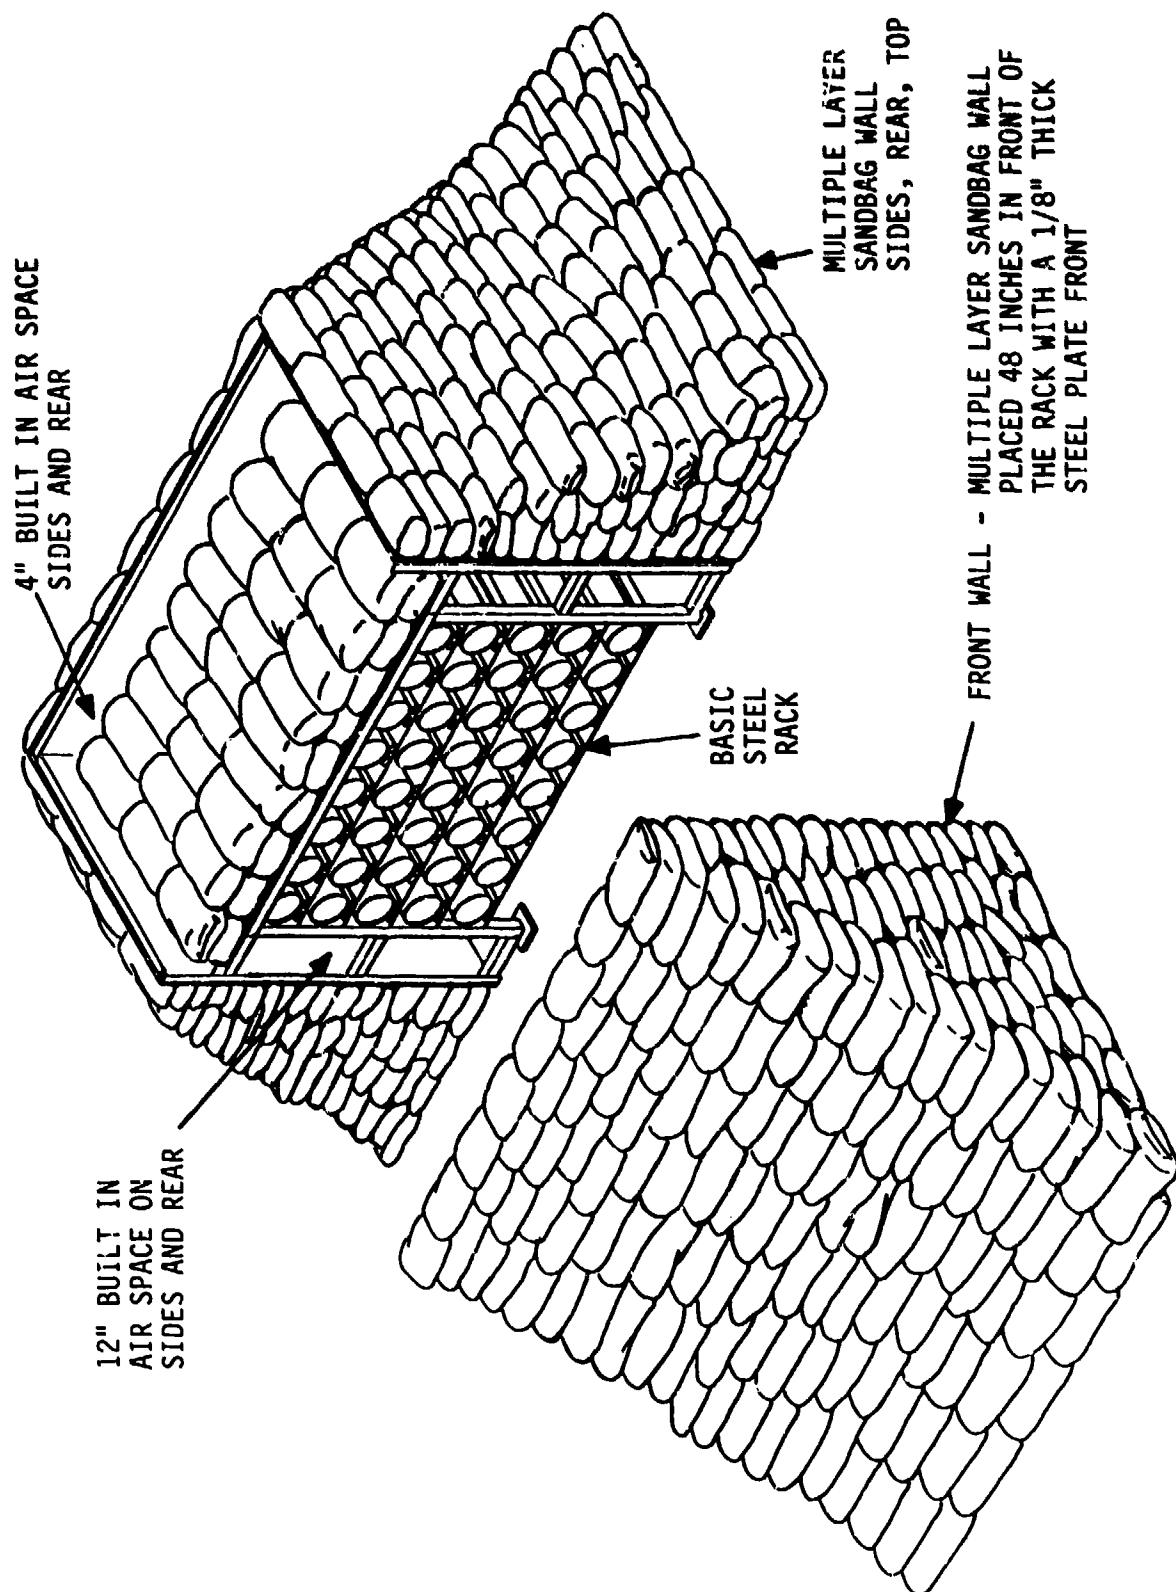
RACK WITH MULTIPLE LAYER SANDBAG WALL
